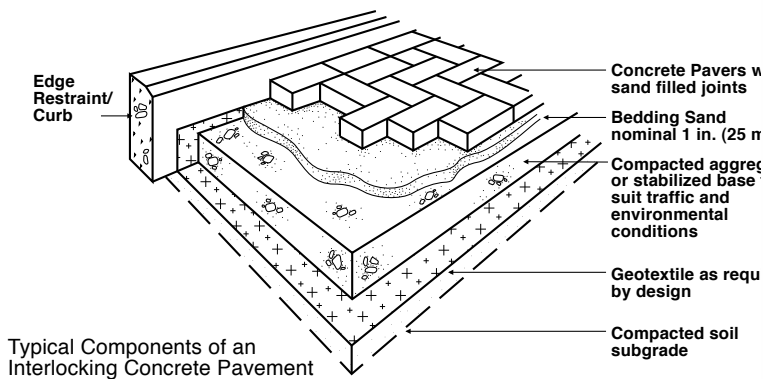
Schematic cross section of interlocking concrete pavement (ICP)
